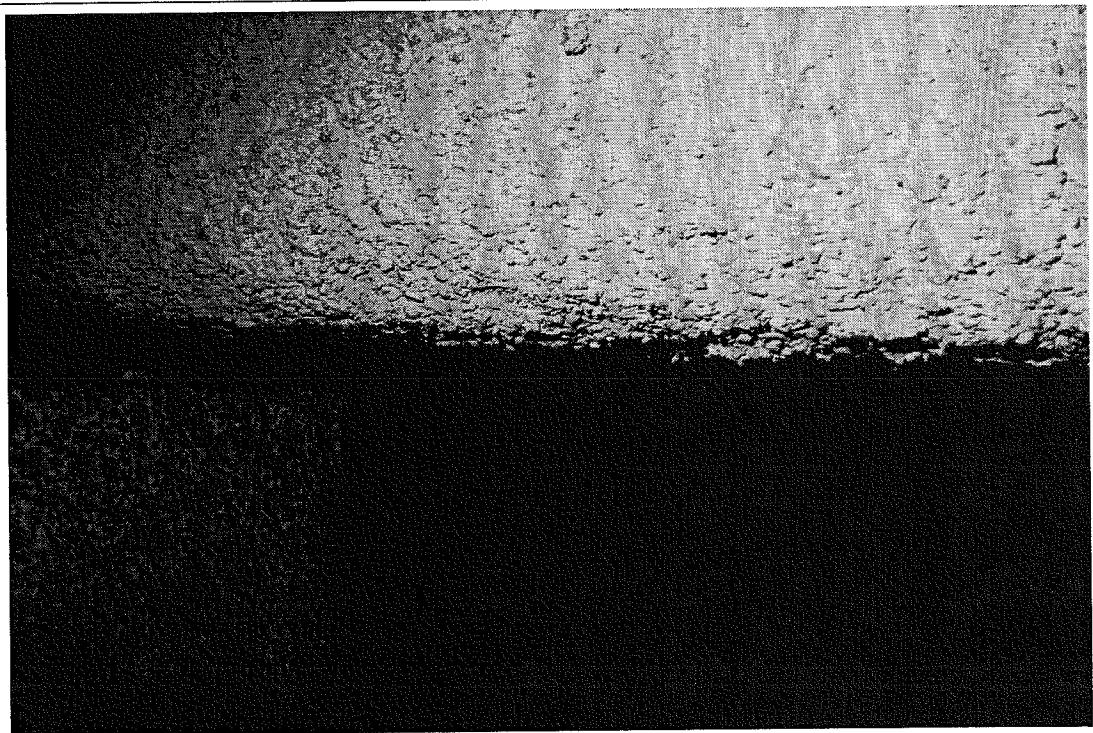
Main Passenger Lobby Upper Mezzanine Office Area – close-up of spray applied fireproofing on concrete deck above suspended ceiling
